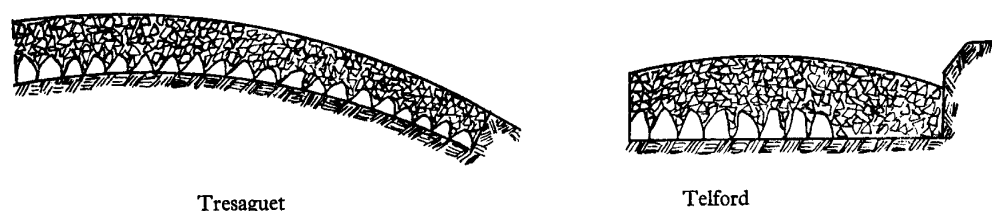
Construction and constructive elements of the Tresaguet road and Telford road [2]
